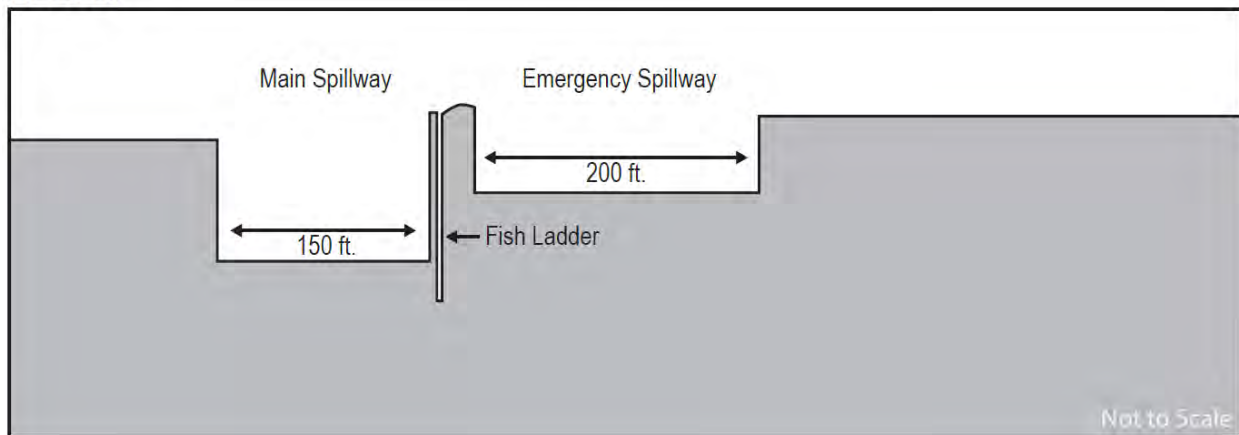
Cross Section of Assawompset Pond Dam Under APC-PR4
